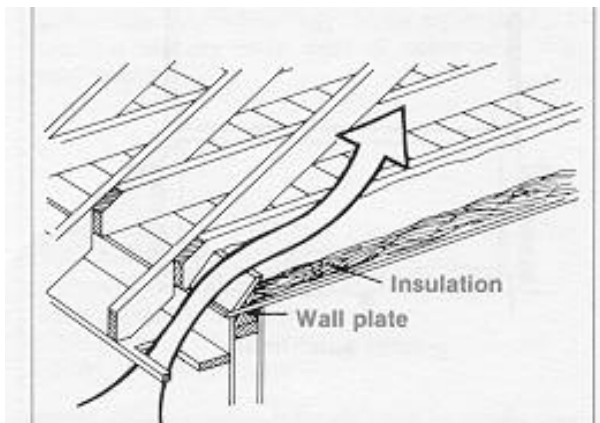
Insulation should cover wall plate but not be jammed against roof boards. Baffles allow air to circulate into the attic from soffit vents, preventing moisture build-up in the attic. Courtesy of Owens-Corning Fiberglas Corporation.
